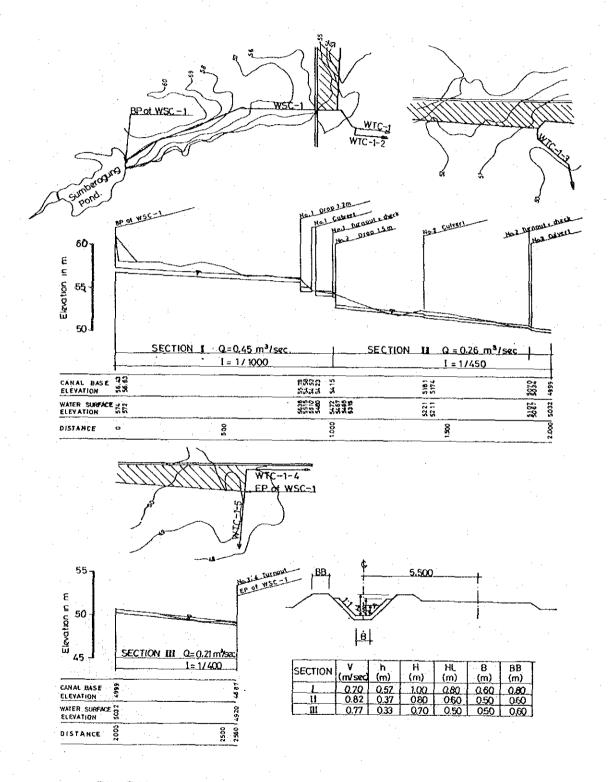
PLAN AND PROFILE OF WSC \_1.
